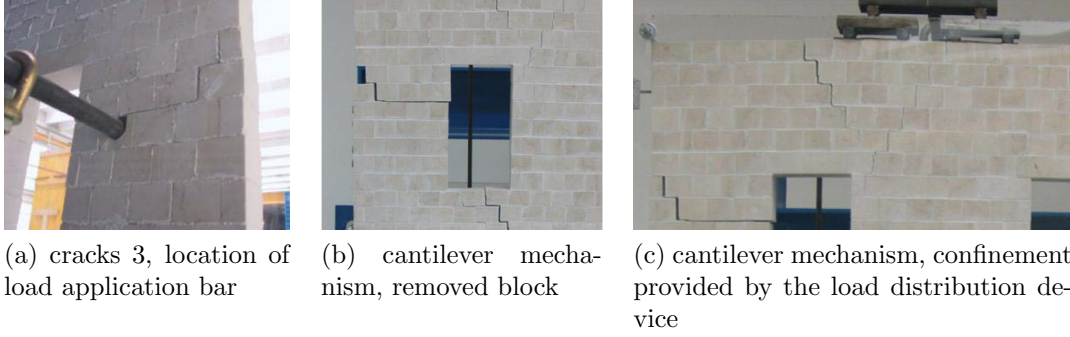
Test 3: Crack pattern details, façade with mortar, test with amplified loading: settlement of the left end column.
